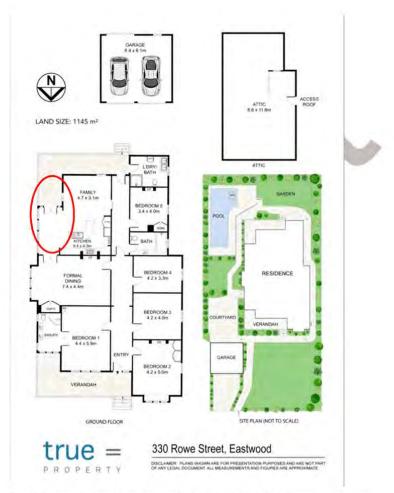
Site plan and floor plan of Kingsley (not to scale), with the partial enclosures of the eastern verandah circled in red. Image sourcewww.realestate.com
